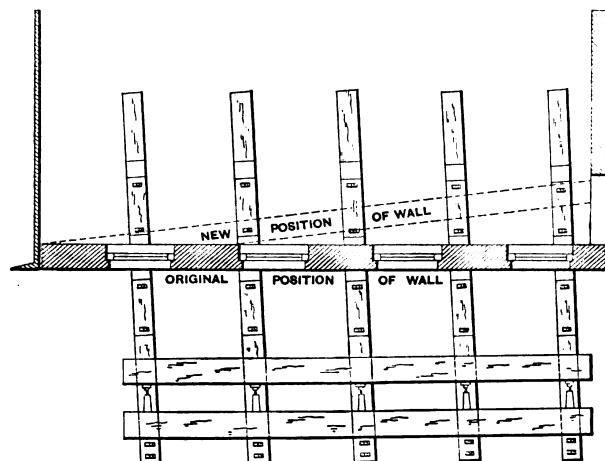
Plan View, showing Position of Old and New Wall, together with Trestle and Jack Screws.
